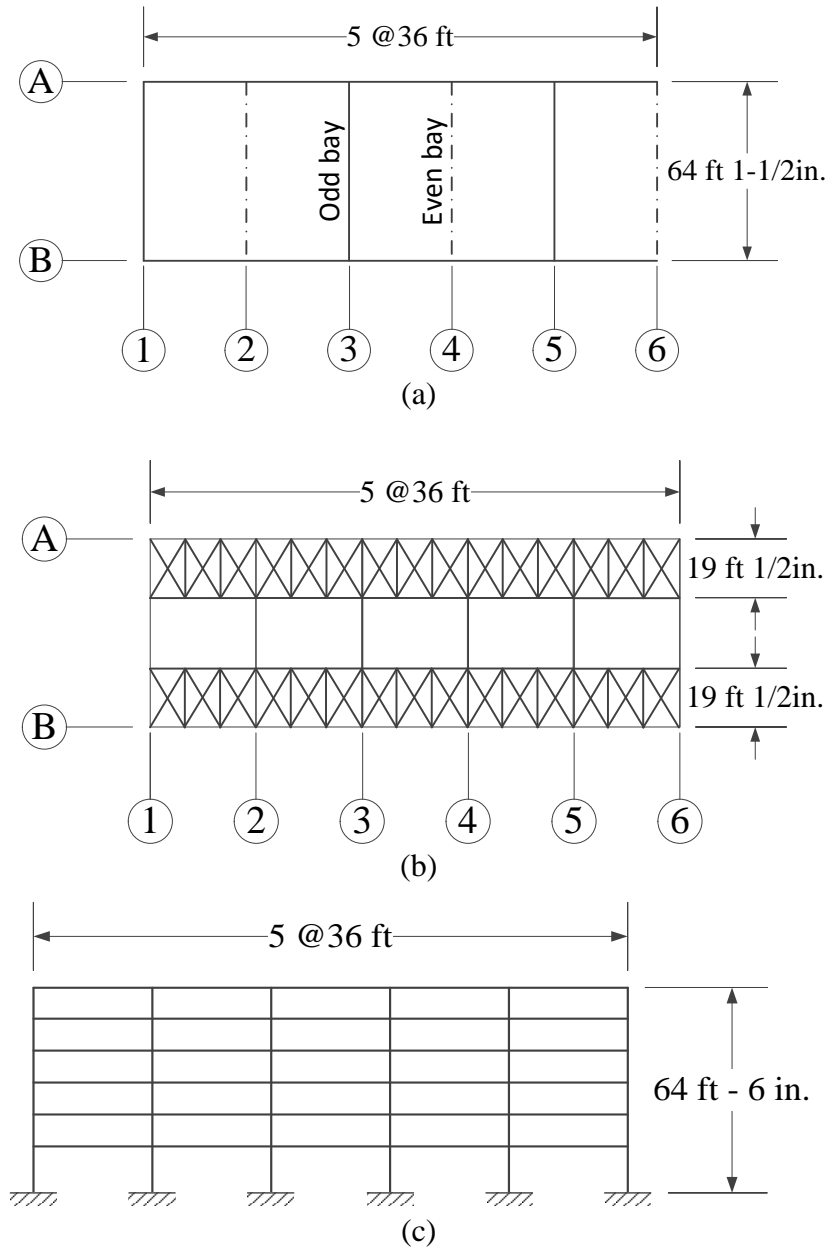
Structural geometry of the 6-story STF buildings: (a) plan view (horizontal trusses not shown for clarity); (b) horizontal trusses; (c) side view (moment frame)
